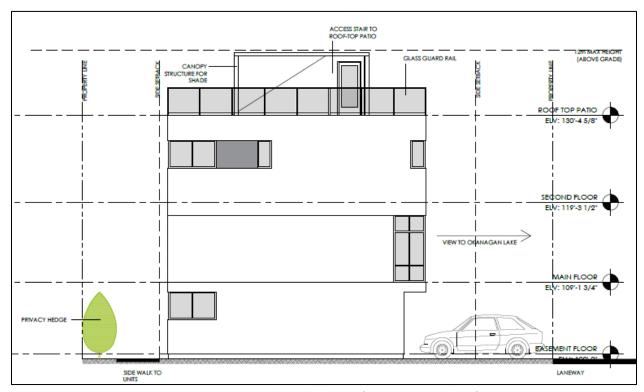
Conceptual North Elevation (Facing 371 Townley St)
